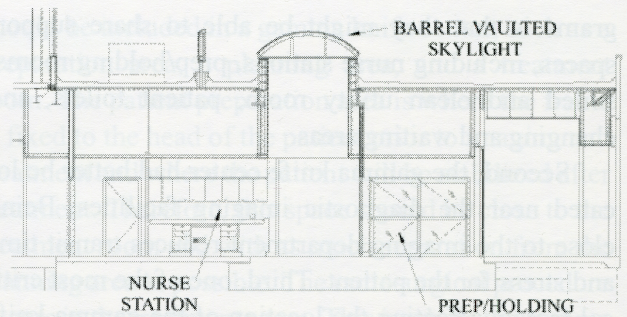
Building section through the vaulted removable skylight.⁸ Photo: © Brian Dressler.
